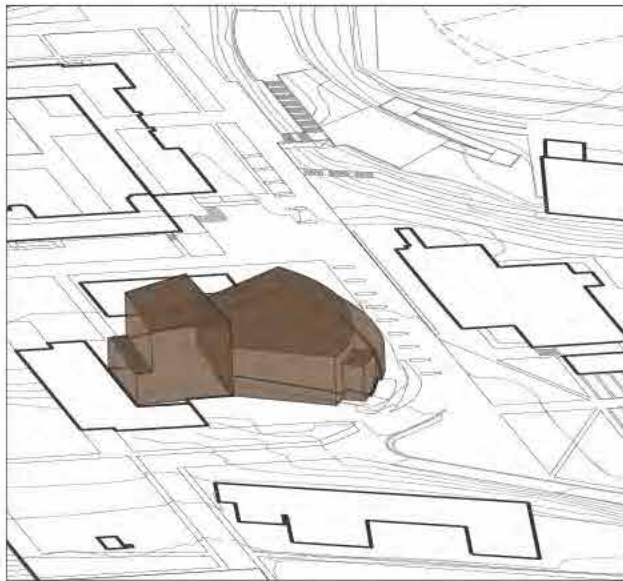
Axonometric and Site Plan of Landis renovation
